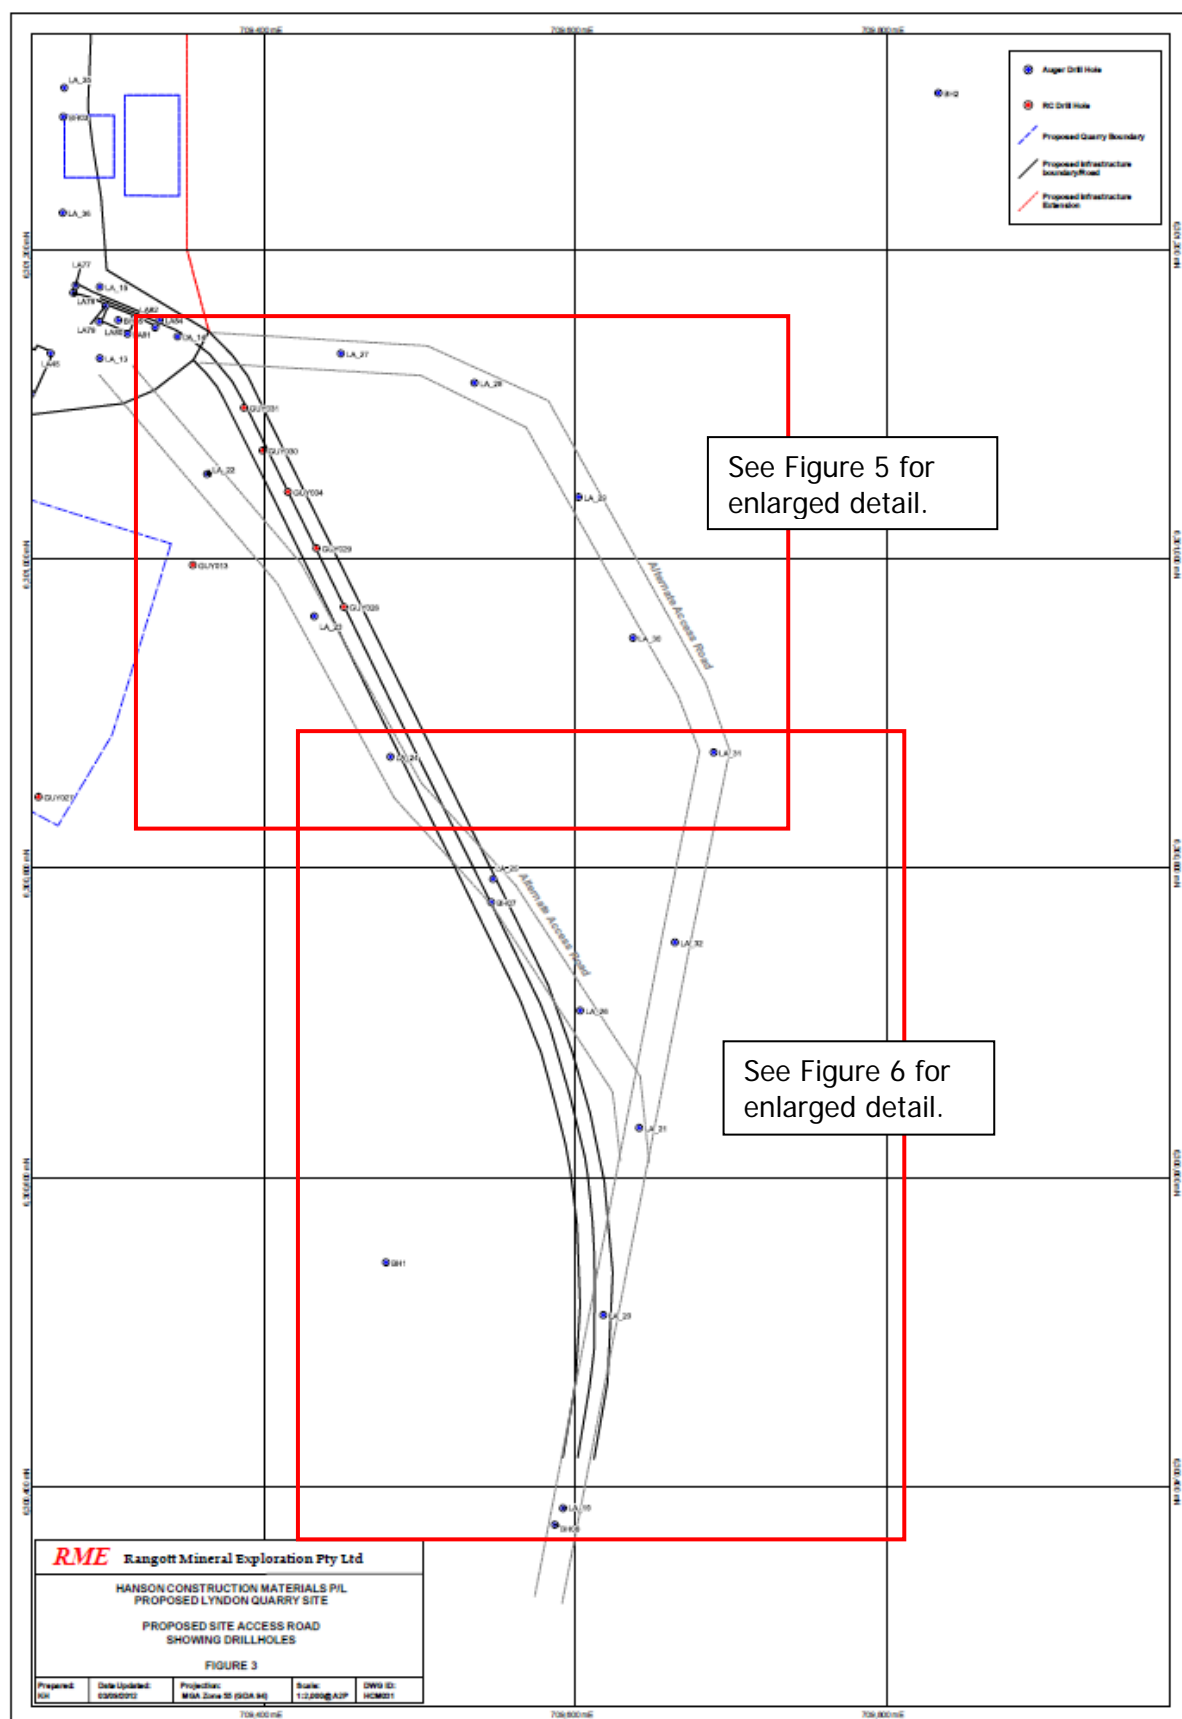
RME, proposed site access road showing exploratory drill holes for NOA identification.
